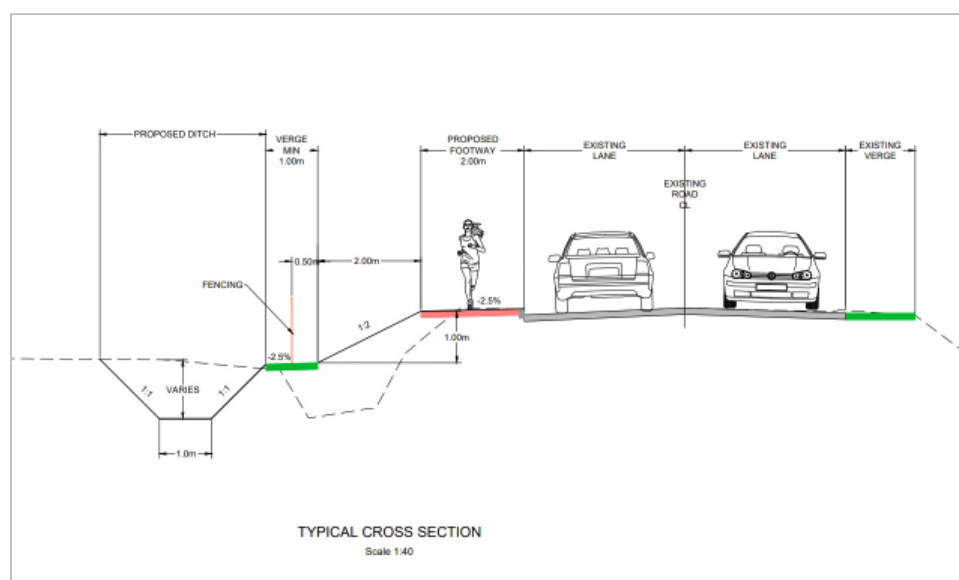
Typical Cross-Section N54 Clones East Drainage Scheme
